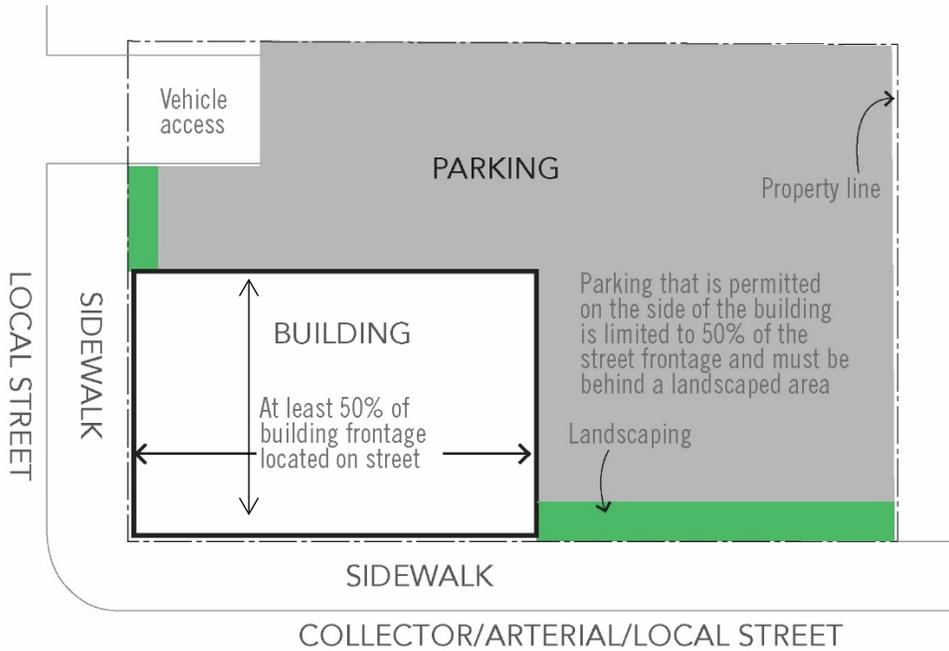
D. Building Placement and Location of Parking, Arterial/Collector/Local Street frontage (typical)
